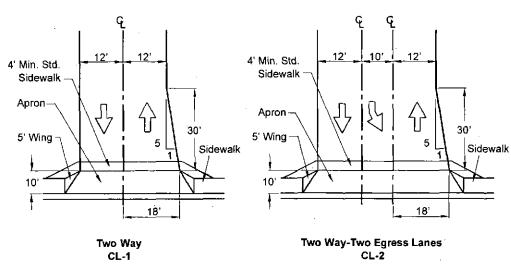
TYPE CL TWO WAY DRIVEWAYS
